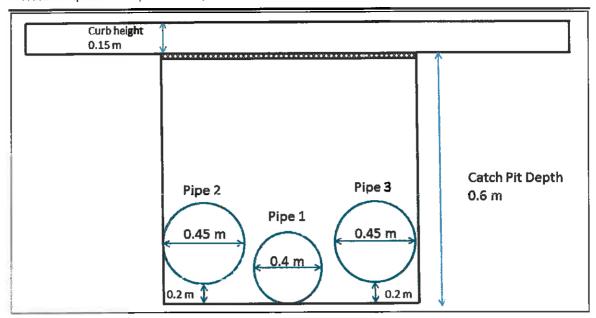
Conceptual Cross Section Schematic of the Catch Pit and the Stormwater diversion Pipes.
